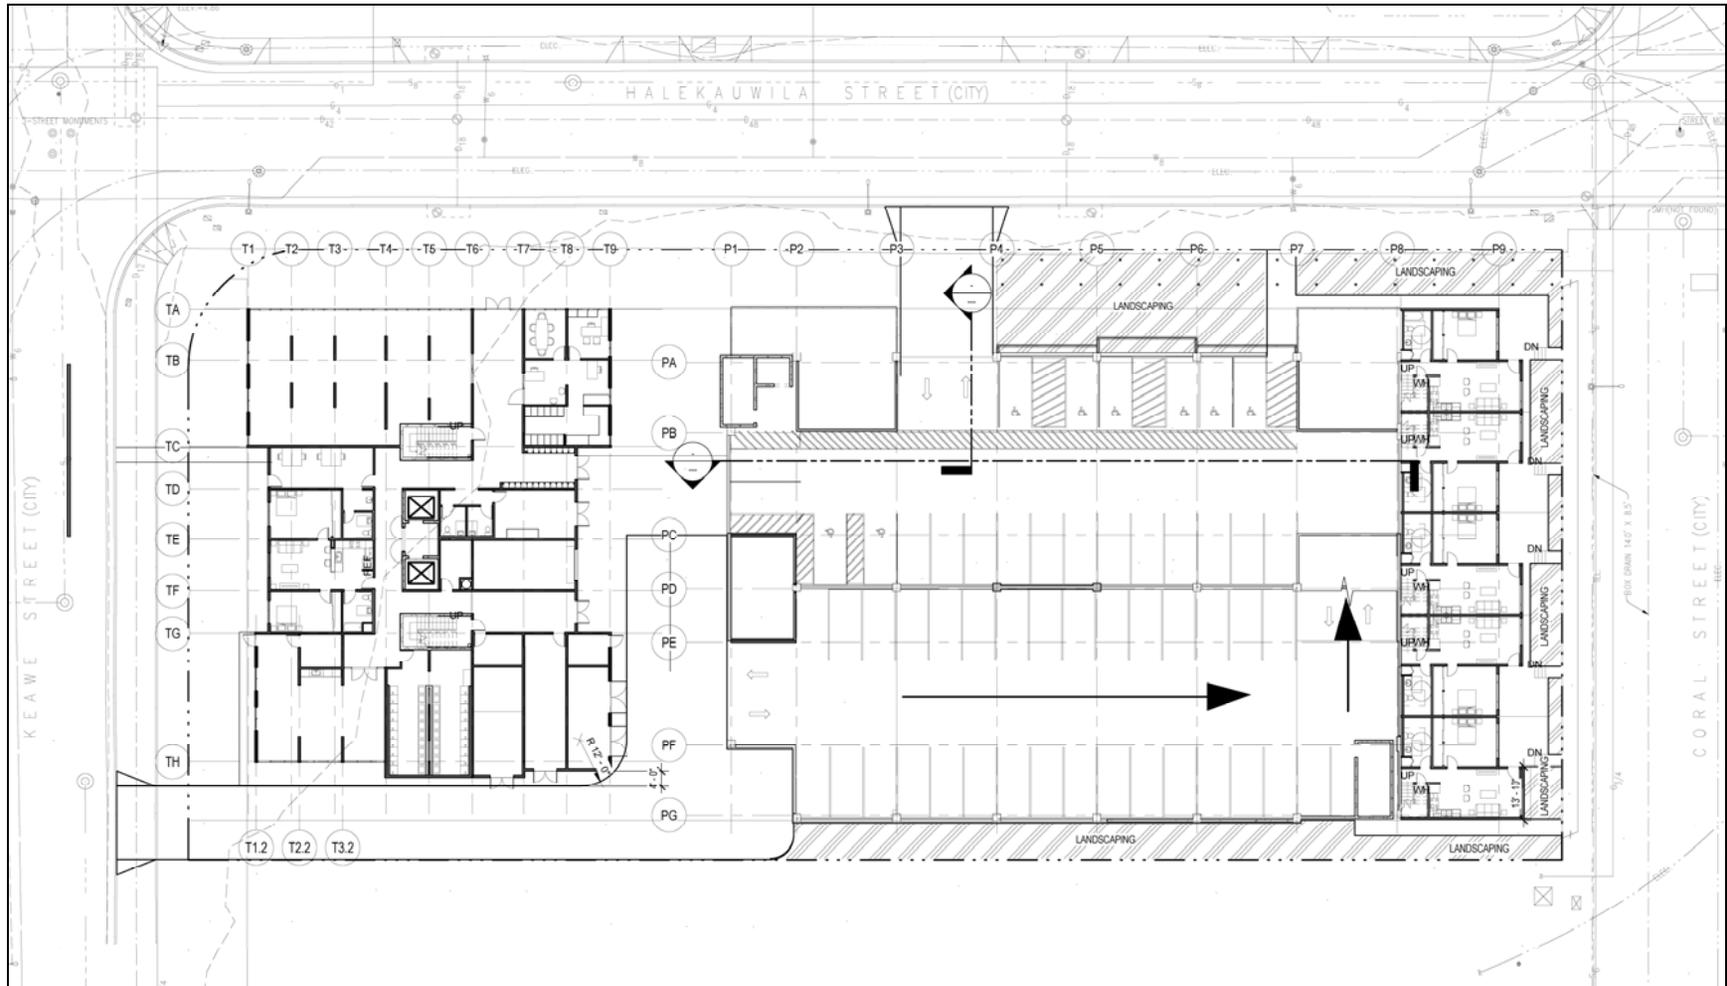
Ground-level site plan of the proposed Halekauwila Place Project (source: Halekauwila Partners, LLC)
